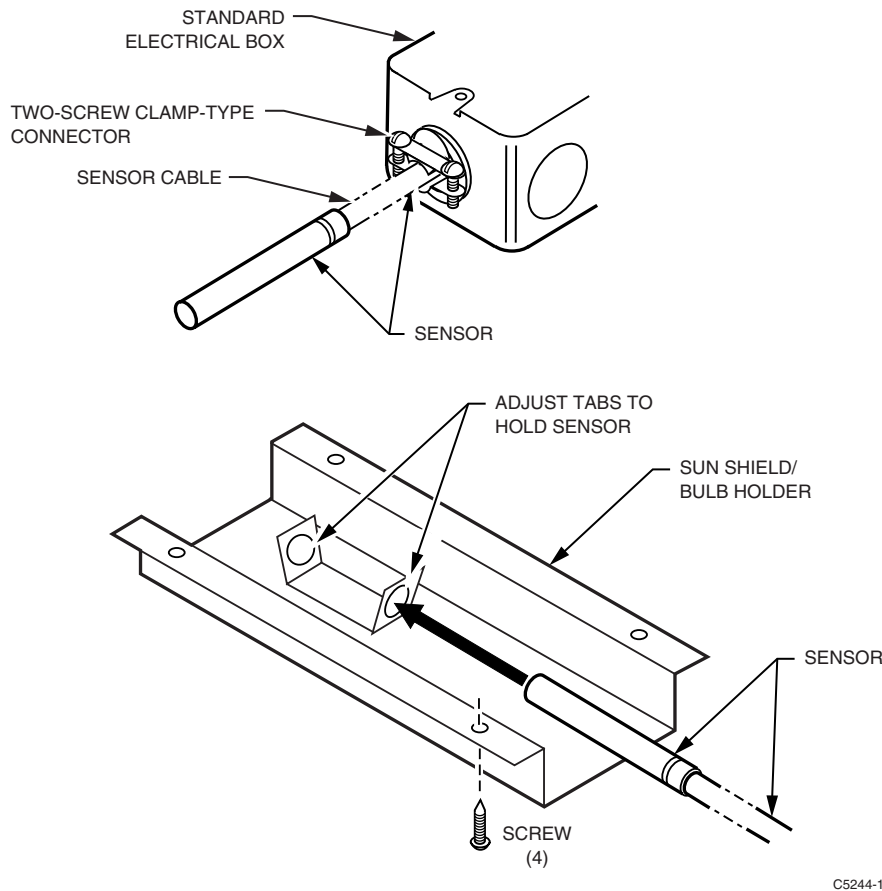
Mounting Sensor on Sun Shield/Bulb Holder.
